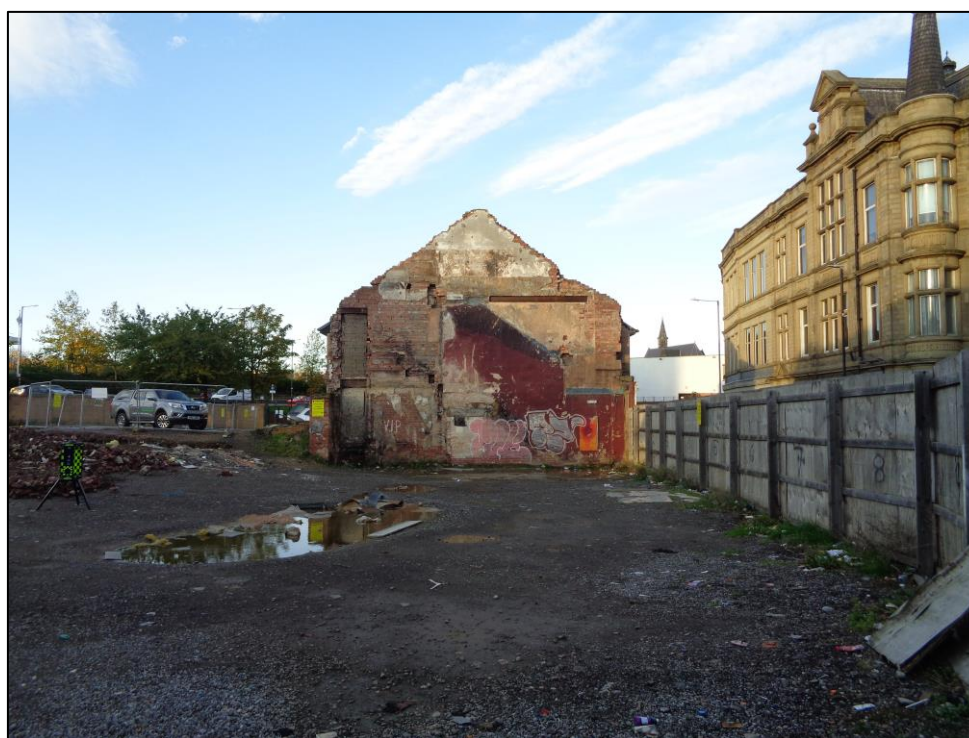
View looking W across the northern half of the site, showing remains of paving in NW corner (adjacent to the modern retail premises)
